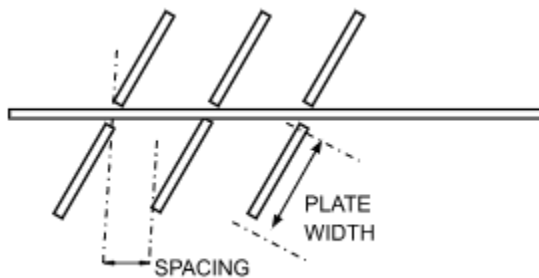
Skewed Stiffeners or Connection Plates
